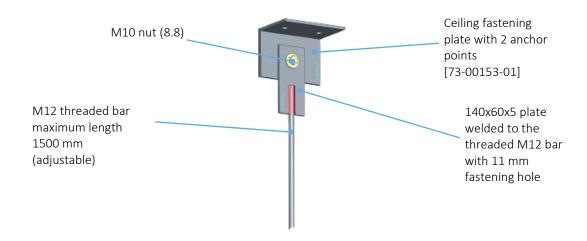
Recommended anchor system - Fastening of L-shaped profiles and threaded bars
